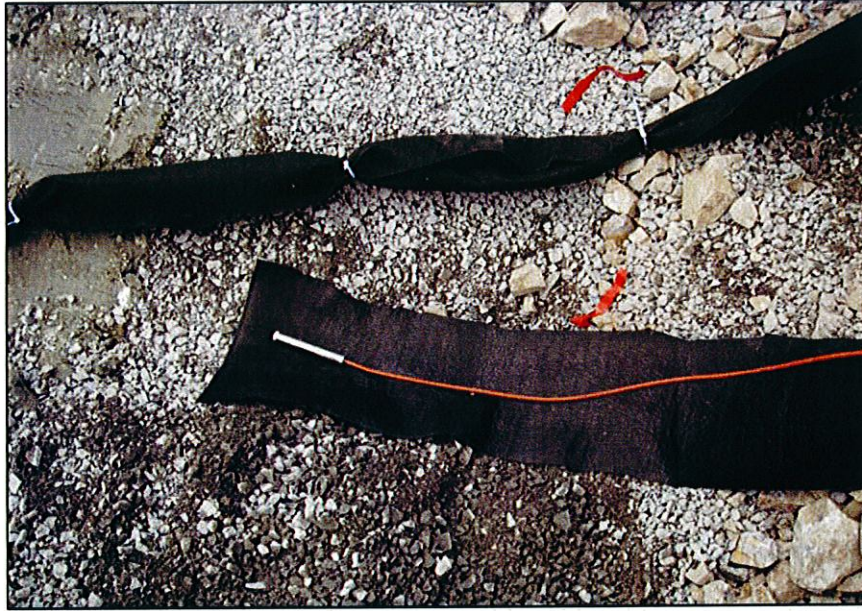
Tailings Piezometer Installation in the Perimeter Embankment
